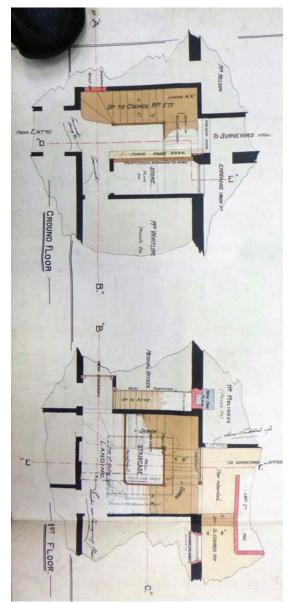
Ground floor and first floor, dated 1903 (CAC(B) Z/1028/2 1901-1904)
